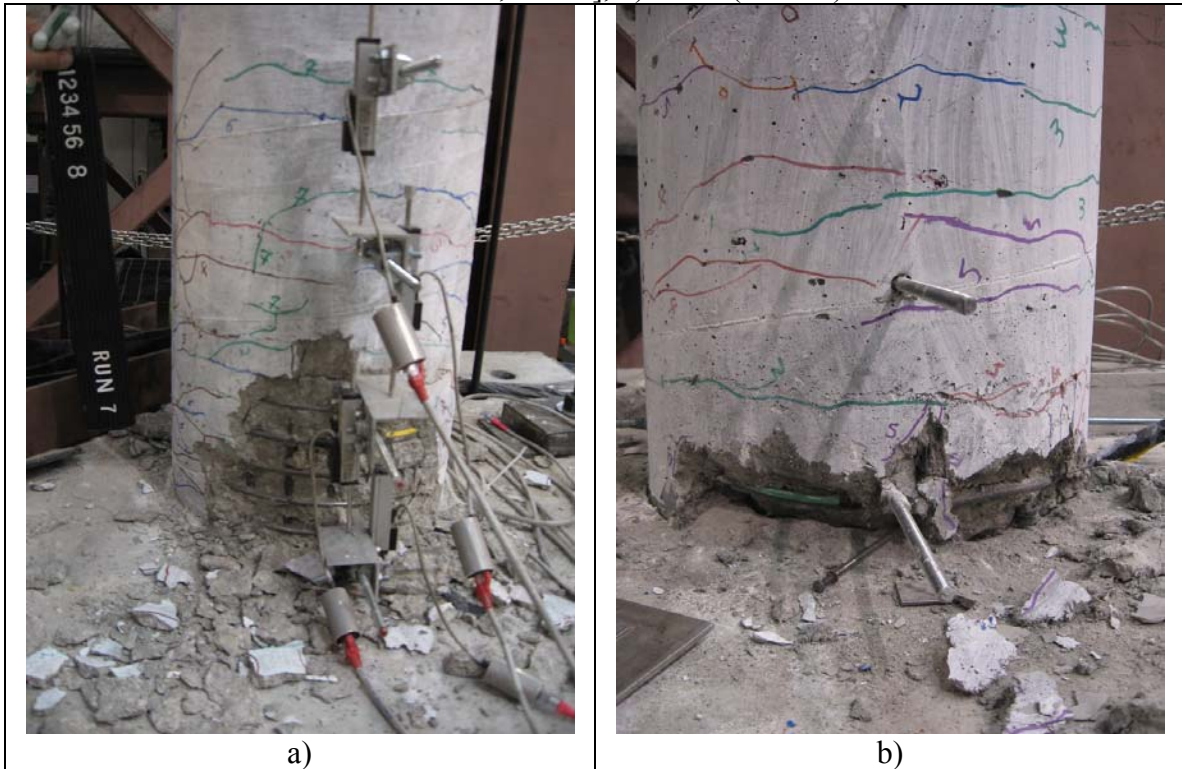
Apparent Damage at Failure Point in RC and RC-ECC Columns, South a) PPTC (CIS) [Zaghi and Saiidi, 2010a], b)PEFB (Precast)
